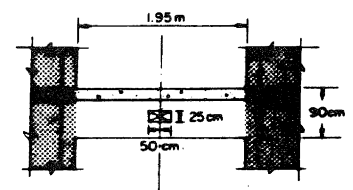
OPENING IN CORE COUPLING GIRDERS
